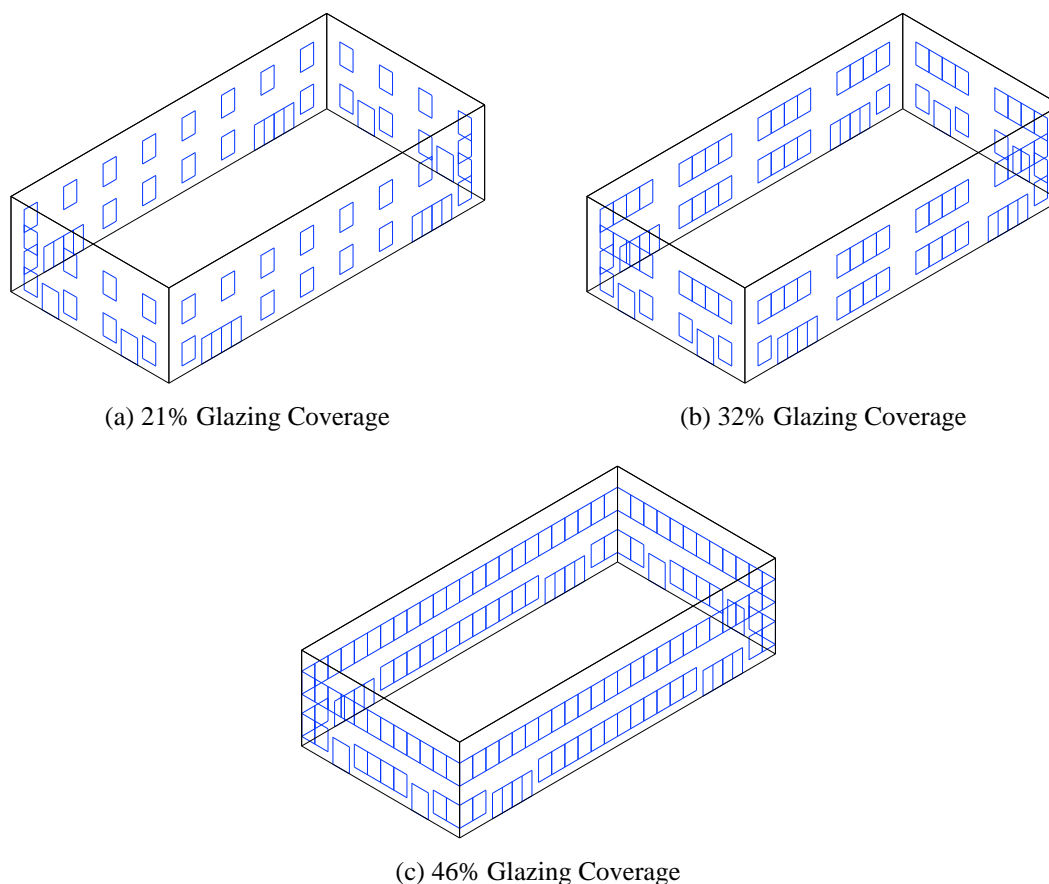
Modeled Two-Story Fully-Engineered Buildings.
